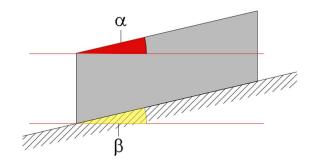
Sectional view of wall with slope:  $\alpha$  slope wall top;  $\beta$  slope wall base joint (drawing: S. Caregnato).
